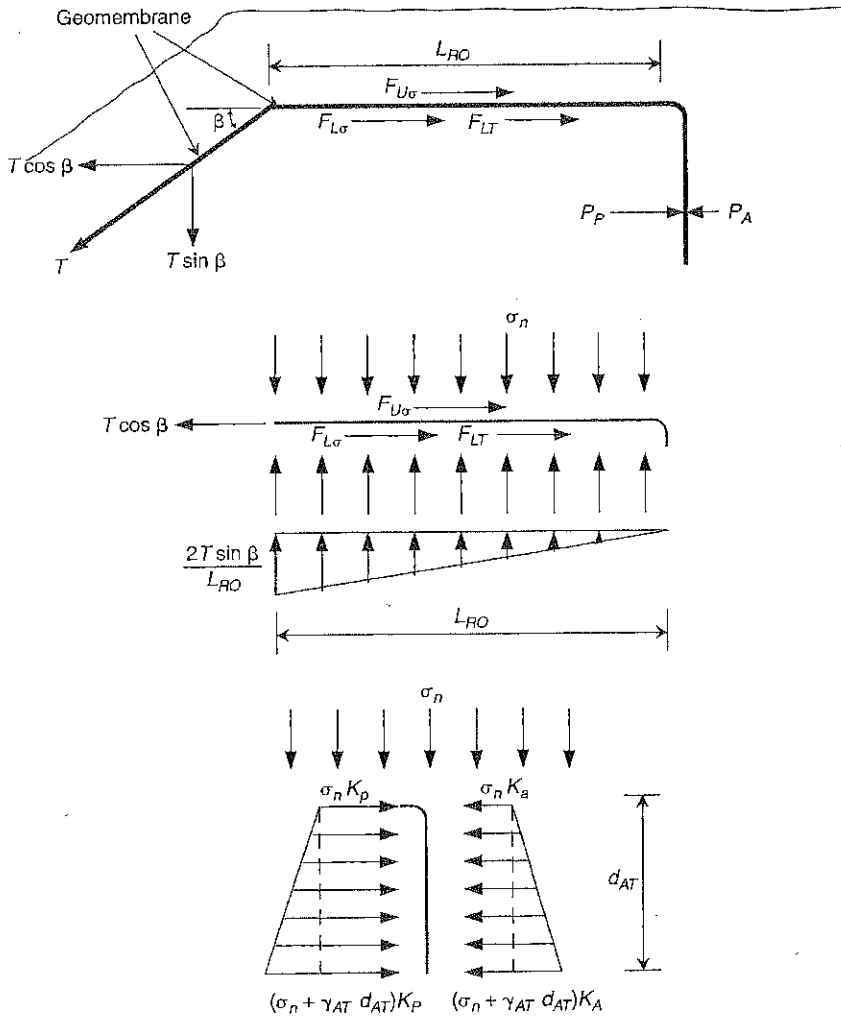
Cross section of geomembrane runout section with anchor trench and related stresses and forces involved.
